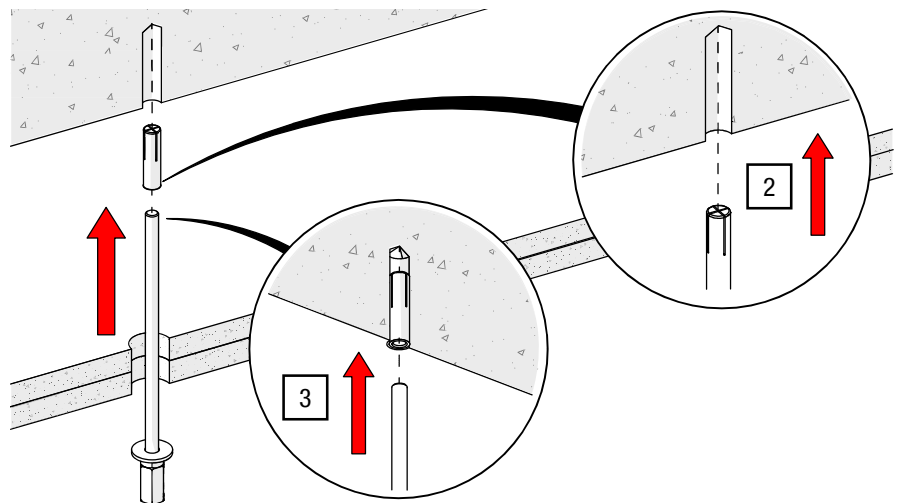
Ceiling suspension – mount drive-in anchor and threaded rod
